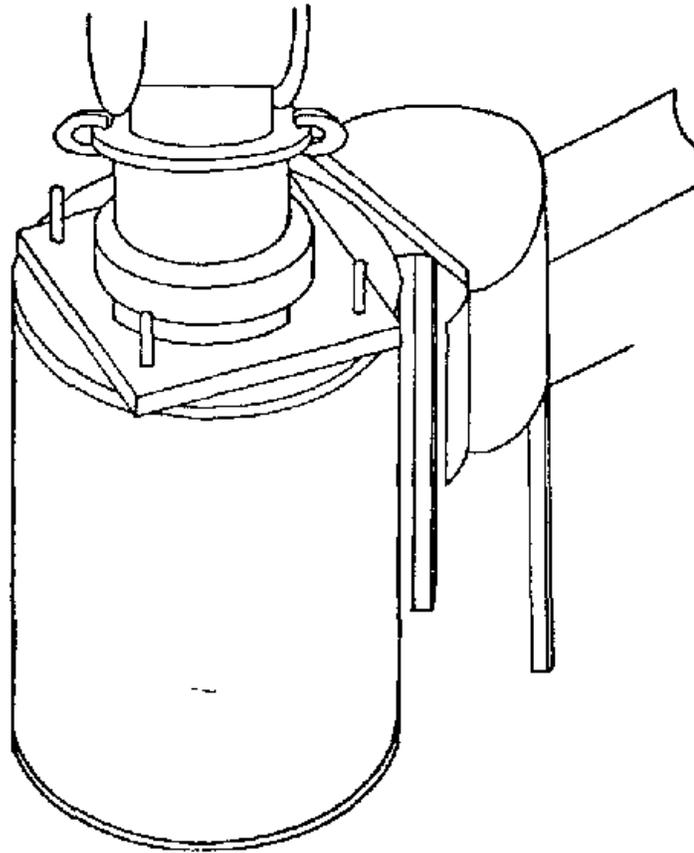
Exhaust Air Takeoff at Drum Loading Stand.
